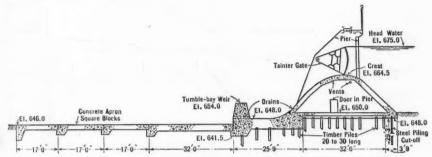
CROSS-SECTION OF PINHOOK DAM SPILLWAY, BAYS 2 TO 6.
